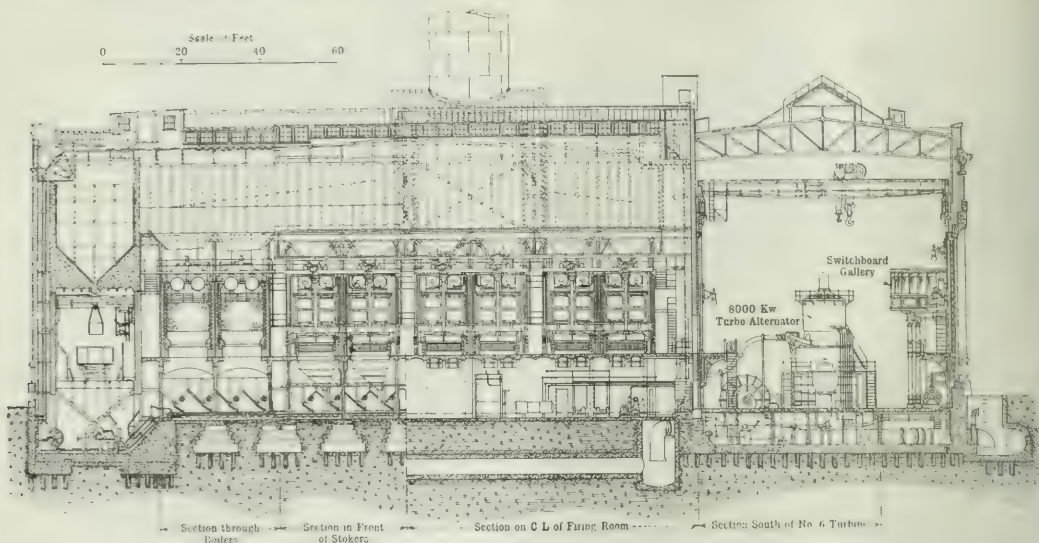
CROSS SECTIONAL ELEVATION AT FRONT OF BOILERS, FISK STREET STATION, CHICAGO.
